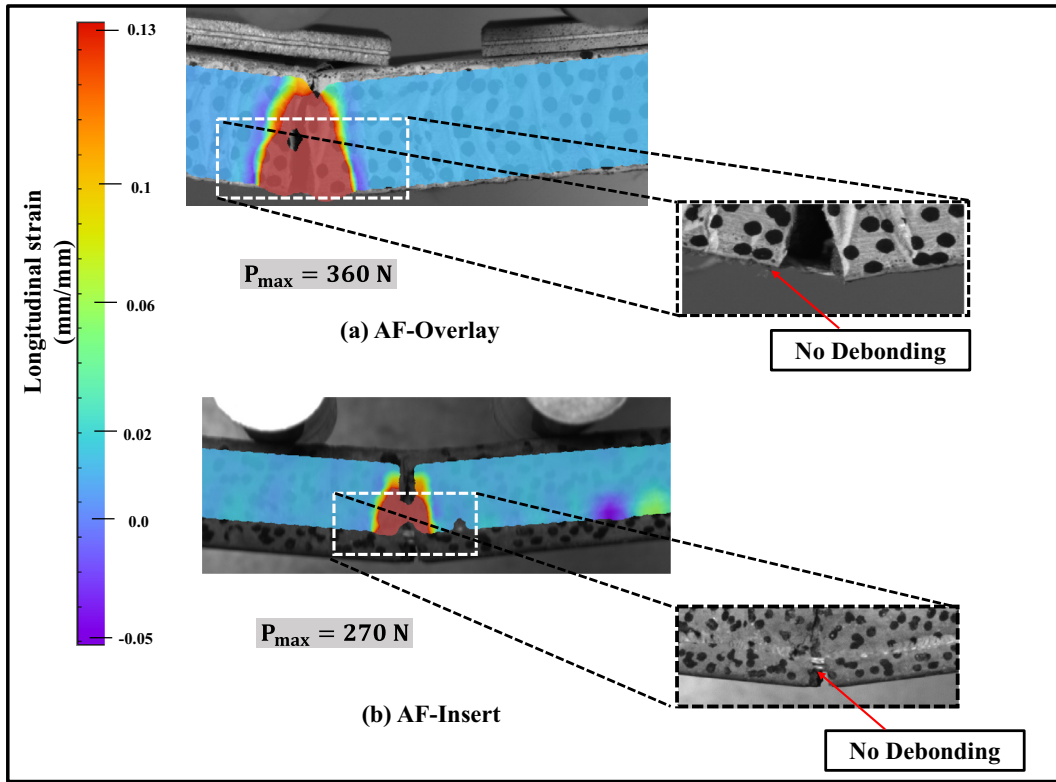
Failure of specimens containing AF specimens under 1 mm/min loading.
